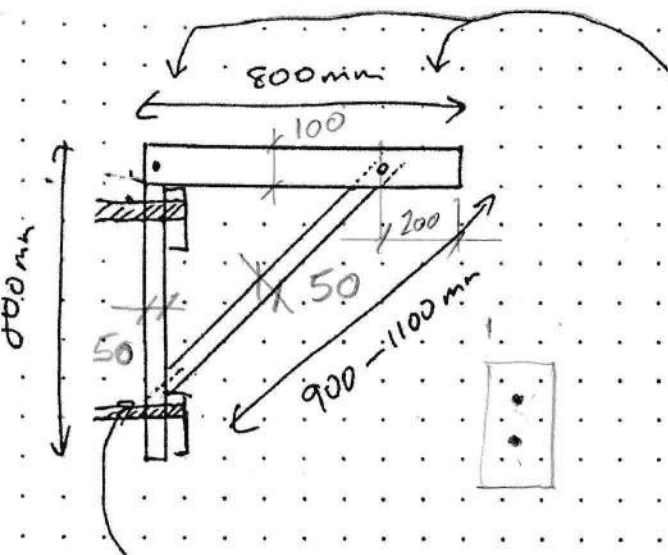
SK-S10 Shts 1-4 shows recommended wales marked up on the original sketch details provided by Treetops Adventure.
